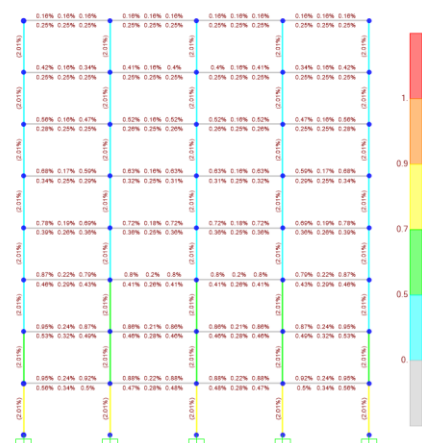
Structure's columns & beams max. percentage of longitudinal reinforcement (axis-1&3) in zone IV
